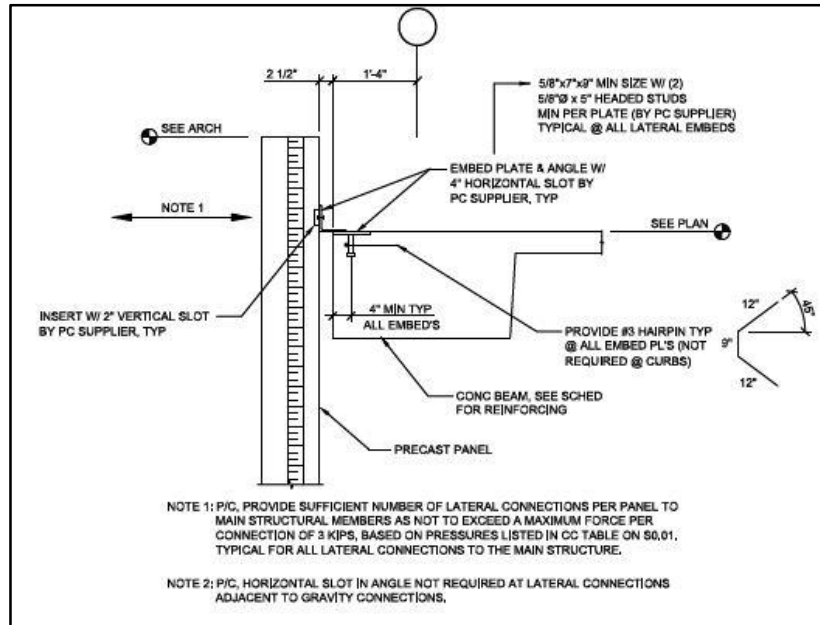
Section Detailing Lateral Connection of Façade to Main Structural Member
